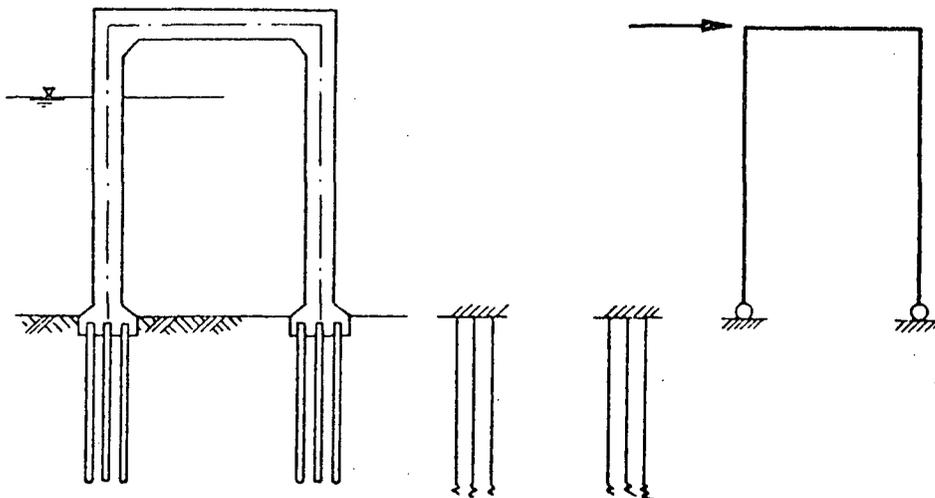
Pier with Cylindrical Trestles Supported by Piles
